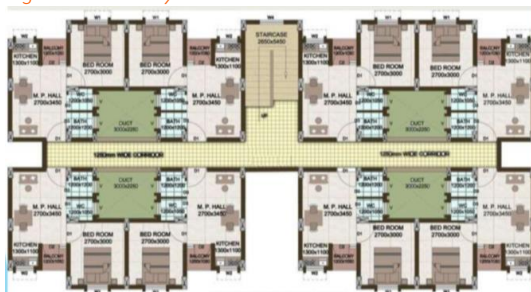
Typical Floor Plan & Unit Plan - Odisha
